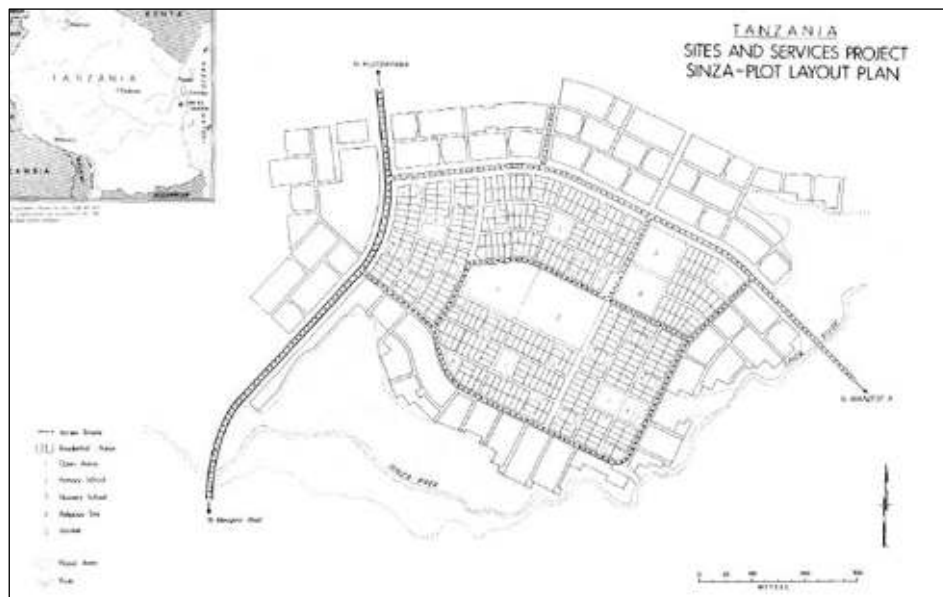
Layout Plan for one neighbourhood unit in Sinza. Source: Worldbank Report 337a-TA, 1974)
